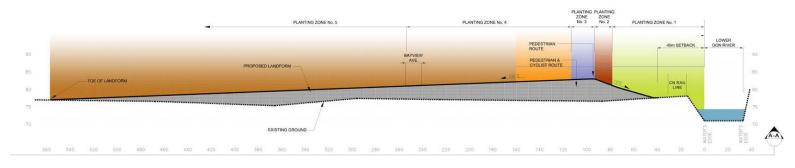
Flood Protection Landform Vegetation Zones (Section View)
